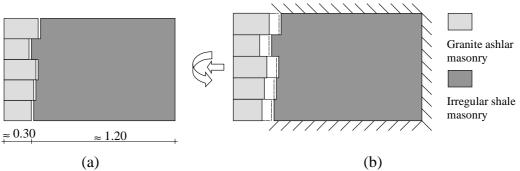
Wall of the main façade: (a) geometry and (b) observed movements
